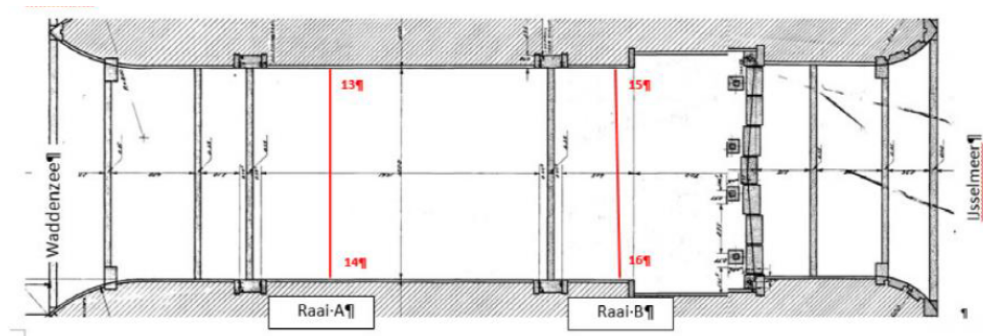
Boring Locations for each gate in the foundation slab.
